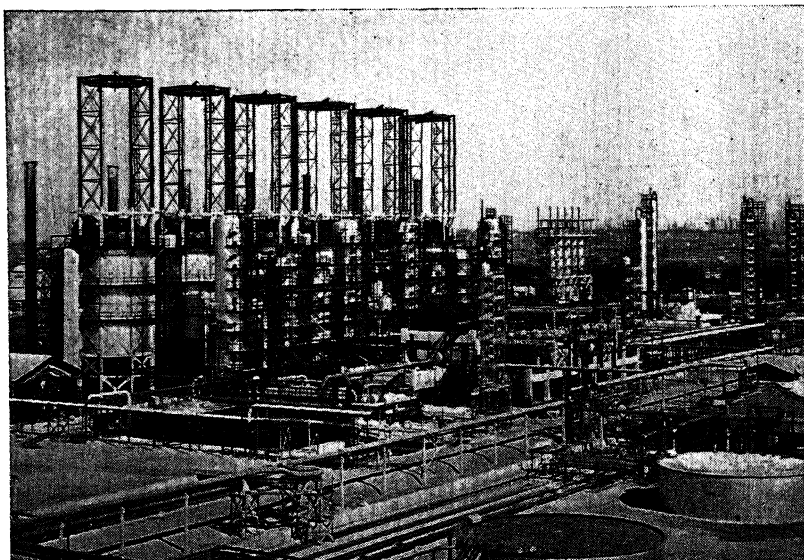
General view of new \$5,000,000 refinery at Watson, Calif. Fractionating towers, 5000 pre-fabricated piped spools and other parts of this plant include about thirty miles of welded joints made with five carloads of shielded arc mild steel electrodes. Storage tanks too are of arc welded construction. See Fig. 1311.
